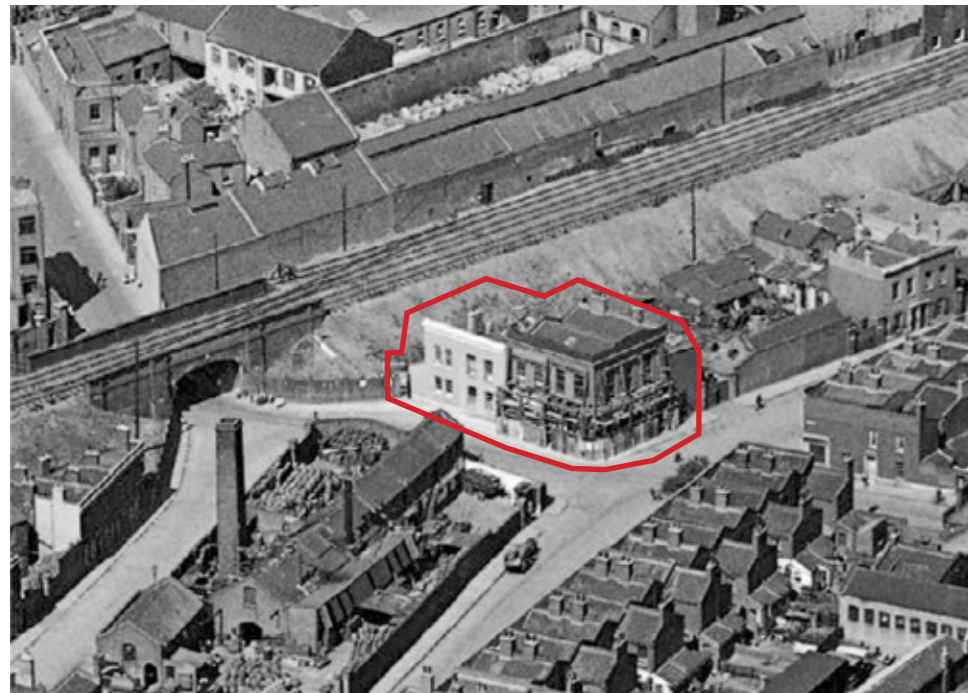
Aerial view showing 1921 refurbishment including new windows, a new frontage in glazed brick. The roof has also been modified at some stage from a pair of parallel pitched roofs to a flat roof.
